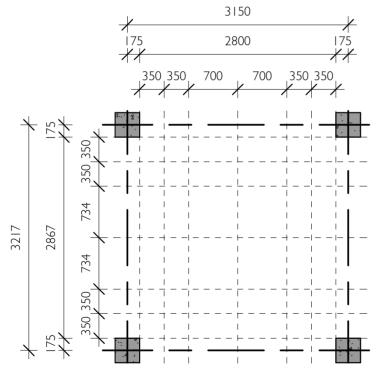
Existing building and facade grid as seen on plan (by Author)
